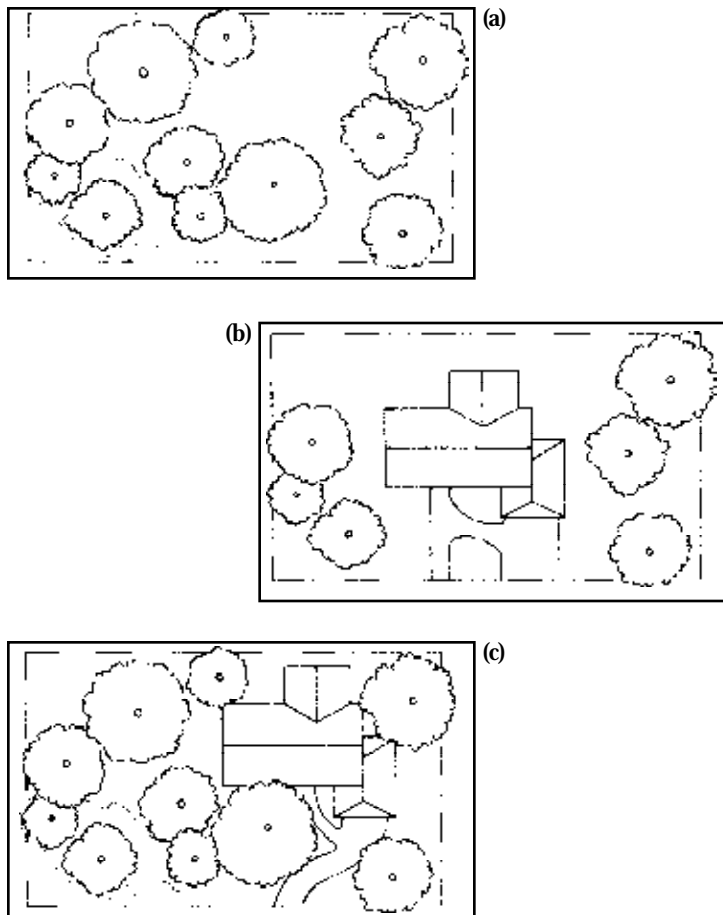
On a wooded lot (a), selecting the center of the lot as the building site (b) conserves less trees than selecting the corner of the lot as the building site (c), which saves more trees.
